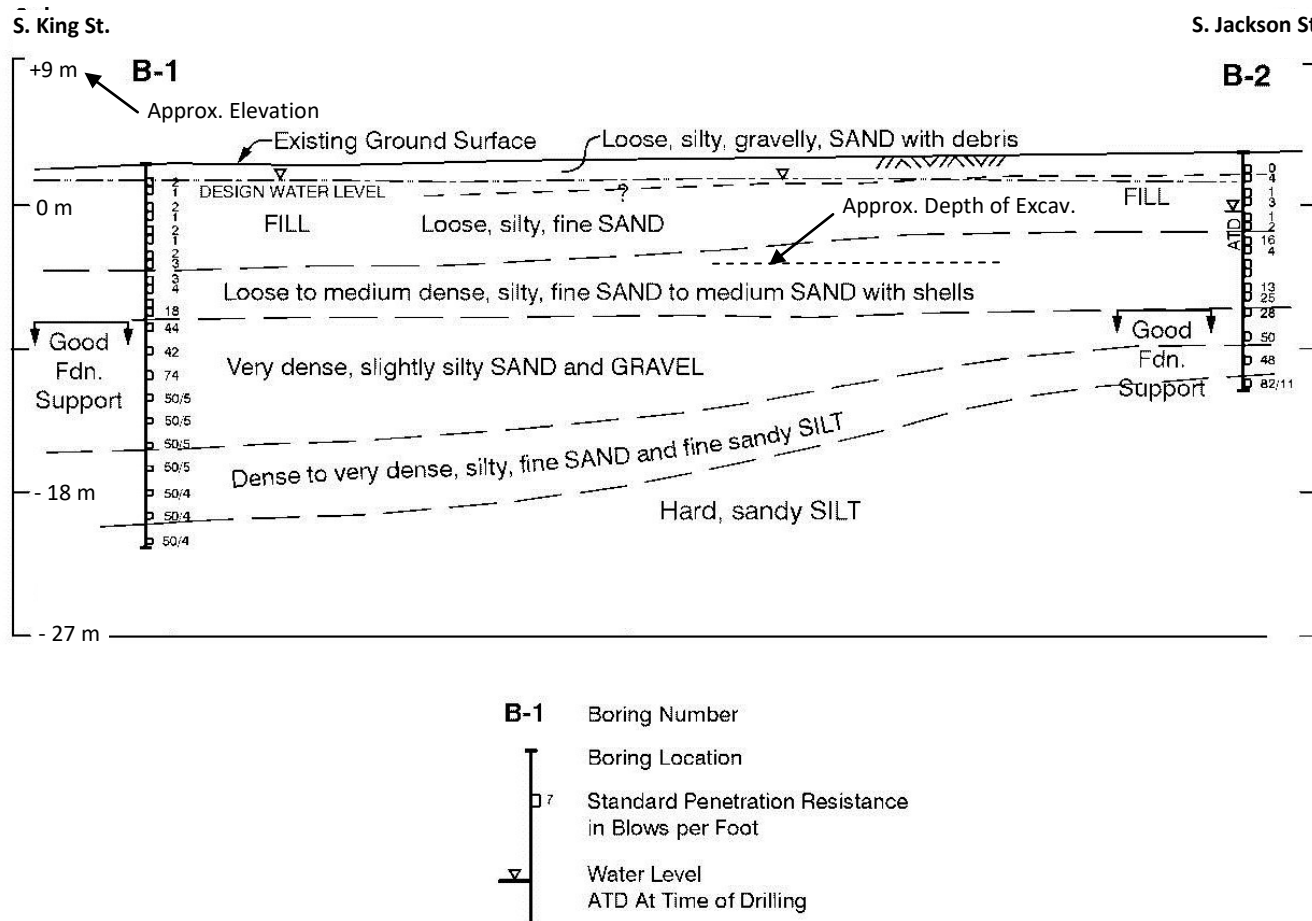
Generalized Subsurface Profile (distance between B-1 and B-2 is approximately 60 m, vertical elevations noted).
